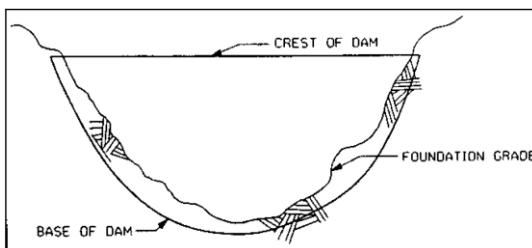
Plan view of arch dam layout (USACE, 1994)
